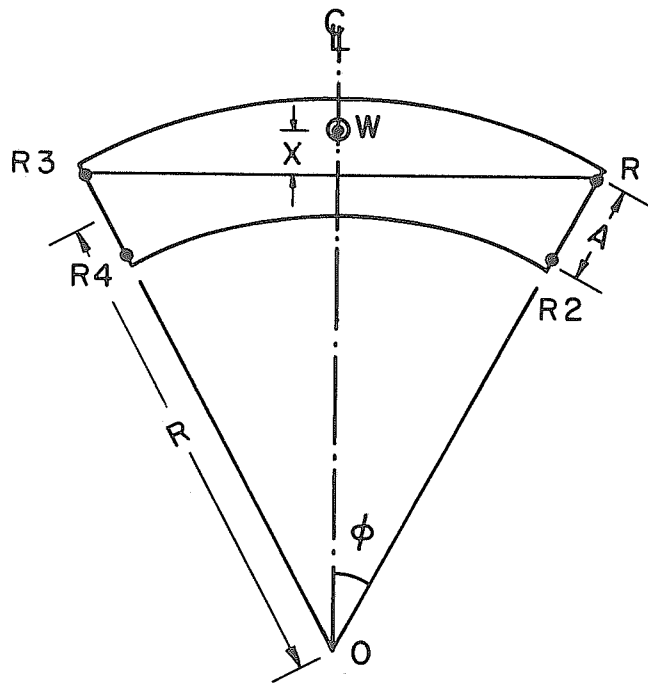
PLAN VIEW OF A CURVED BRIDGE
